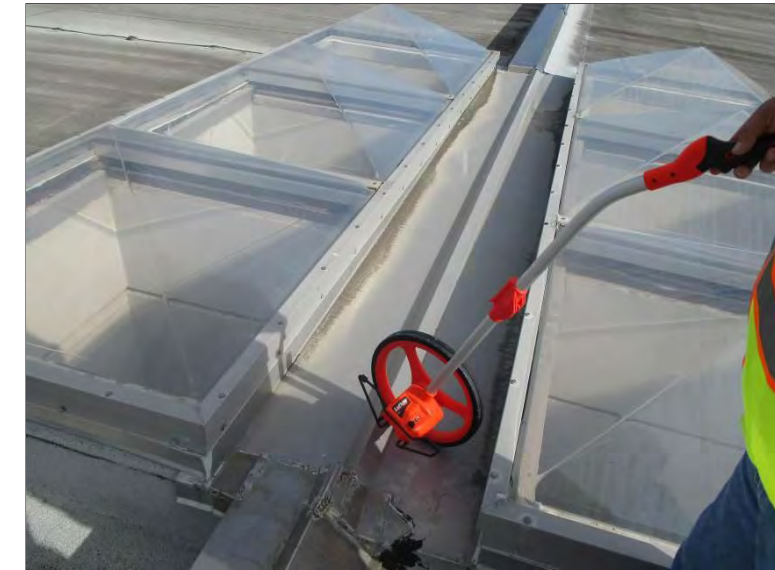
Skylights at the expansion joint on the roof separating the Ticketing and Atrium areas.
